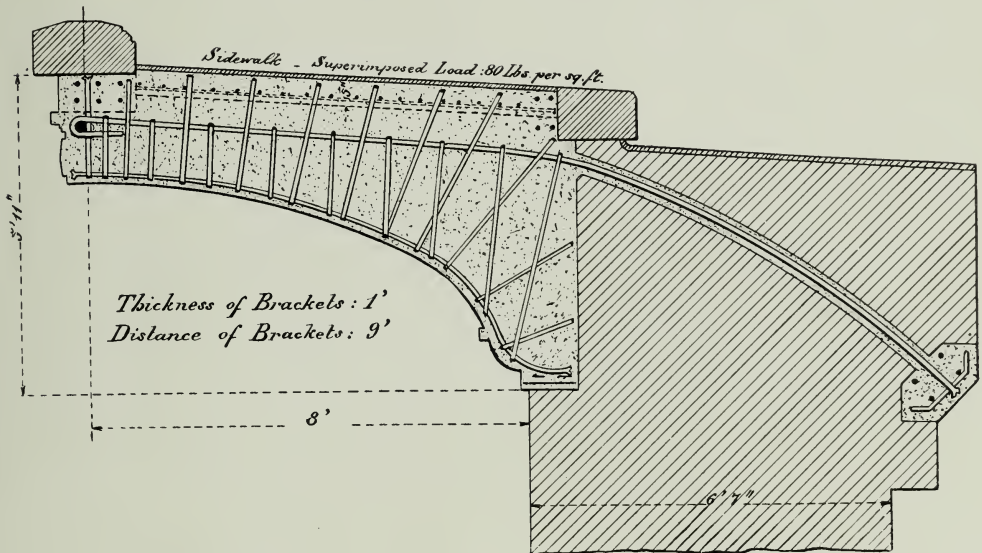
Cantilever of the Sidewalk, Boulevard Pereire, Paris.
